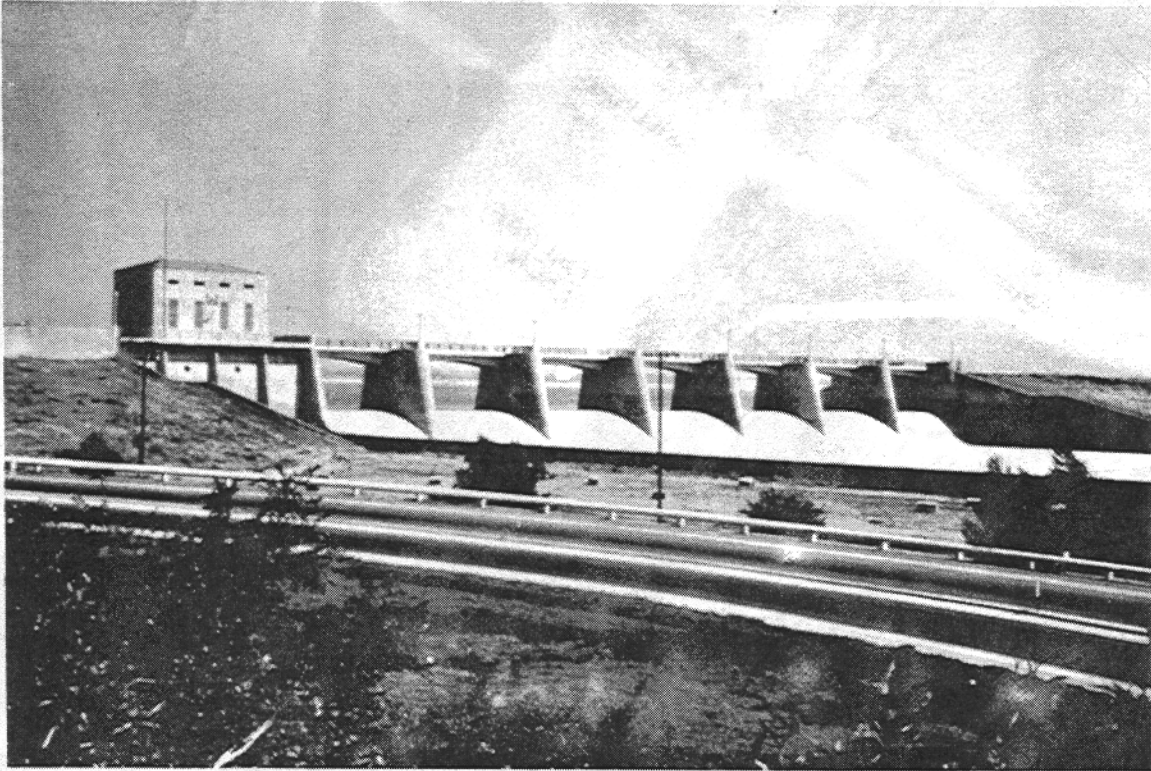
Sepulveda Dam, with Control House (left) and Spillway (view from downstream, along Ventura Freeway).
